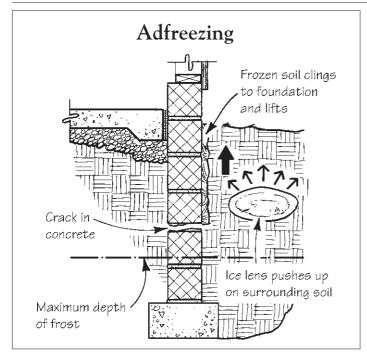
As the soil around an unheated building freezes and expands, it can "grip" the foundation and lift the wall apart (left). Although block walls are particularly susceptible, poured concrete walls can also be damaged (above).
